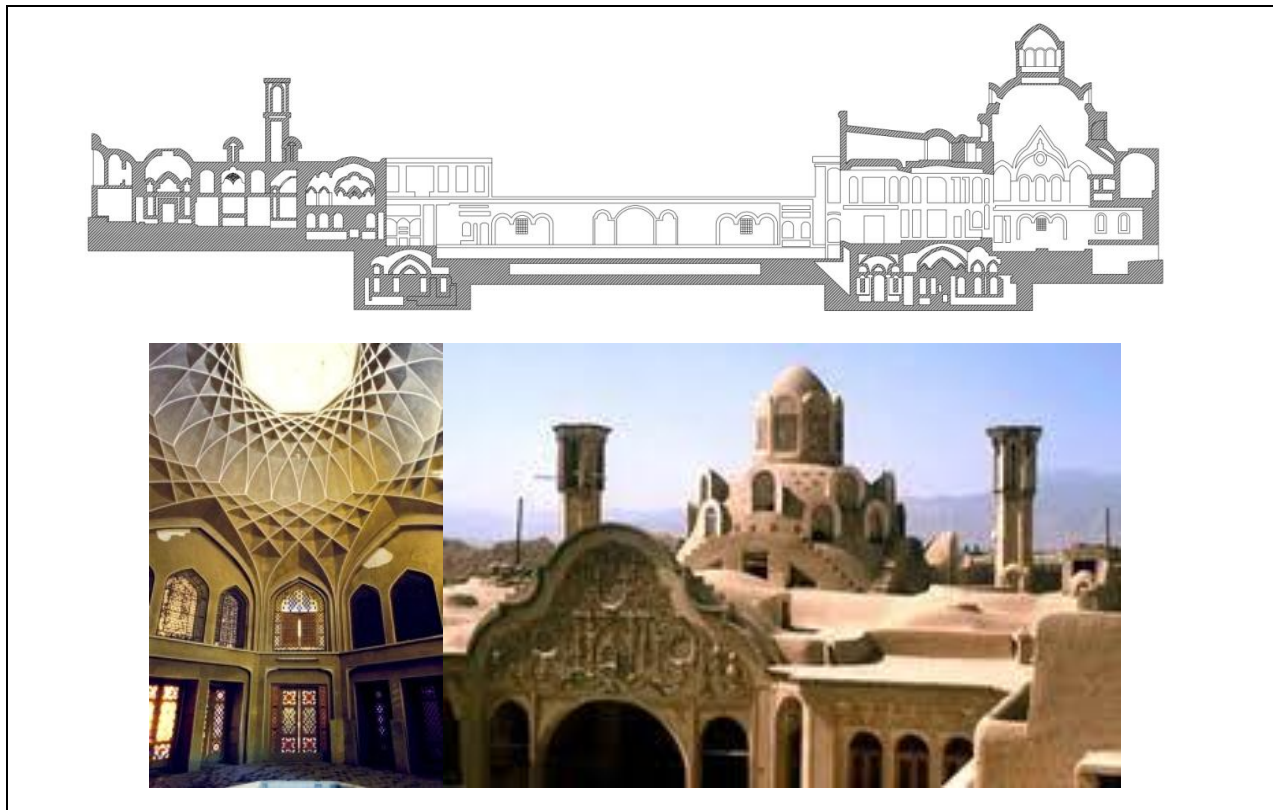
4.Natural ventilation in Boroojerdi ha House [1]
